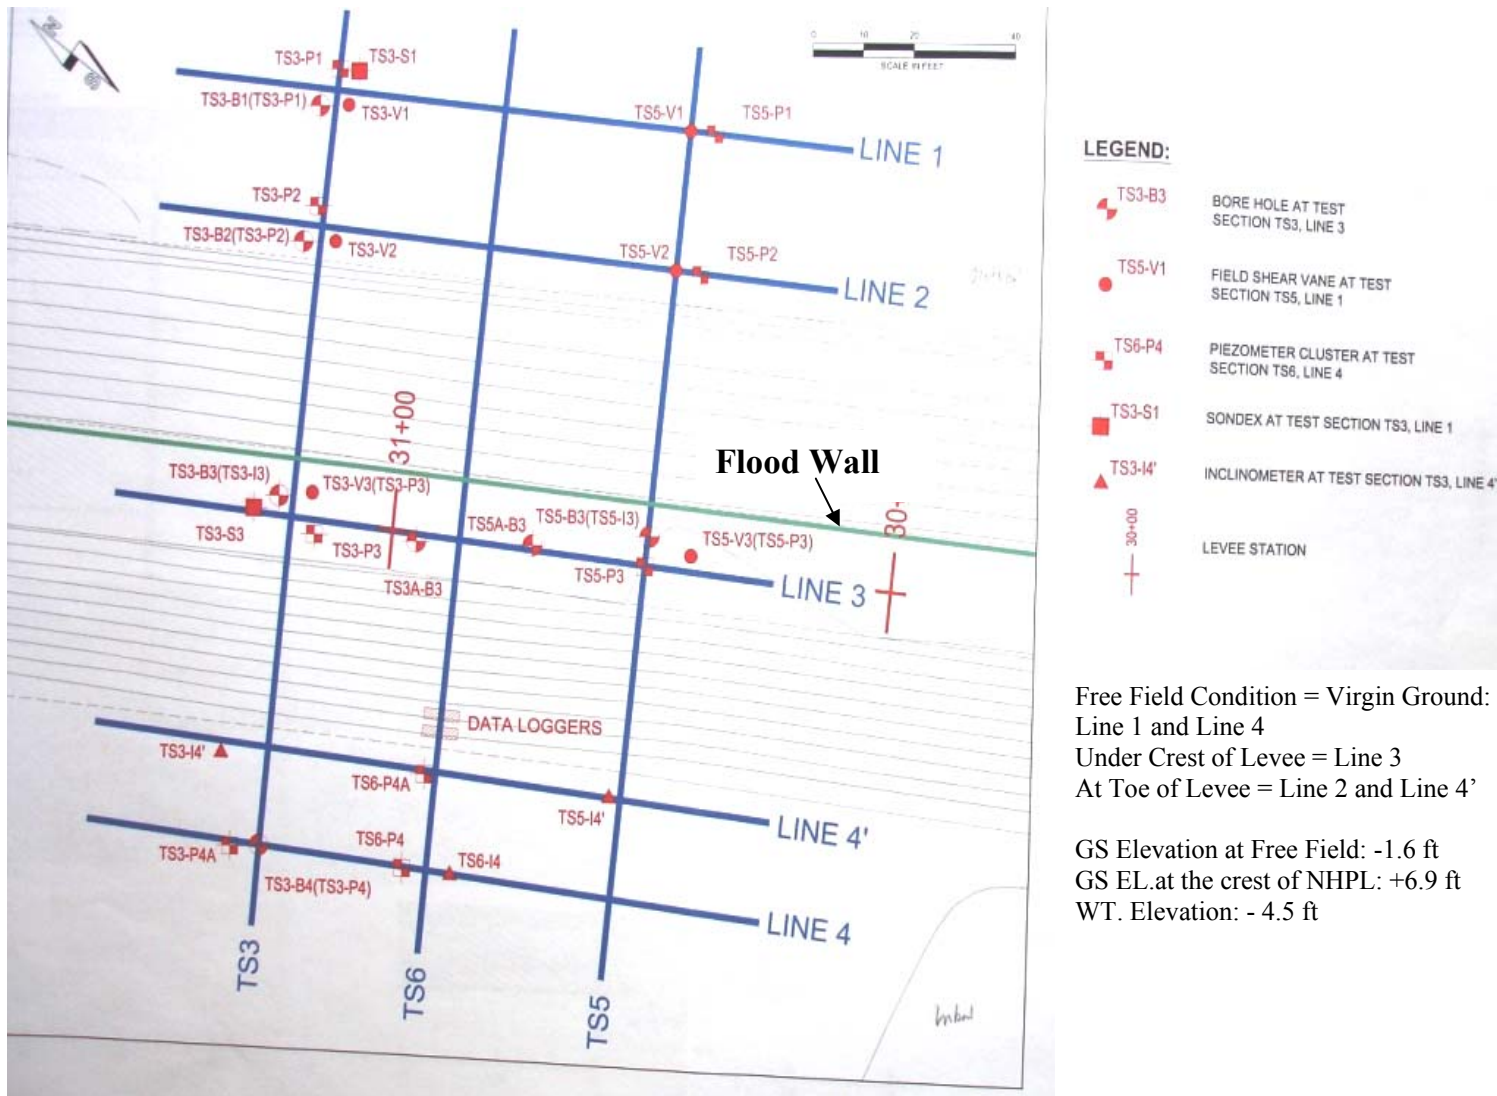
Plan of Test Section Area with Borings, Field Tests and Instrumentation
